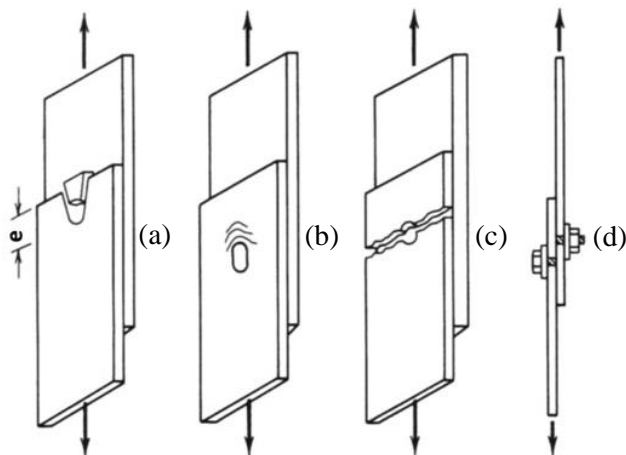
Failure modes of bolted connections: a) tear-out failure of a sheet, b) bearing failure of a sheet, c) tension failure of net section, d) bolt shear failure (Yu and LaBoube, 2010)
